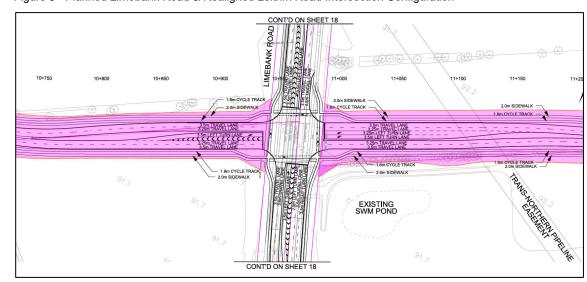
Planned Limebank Road & Realigned Leitrim Road Intersection Configuration
